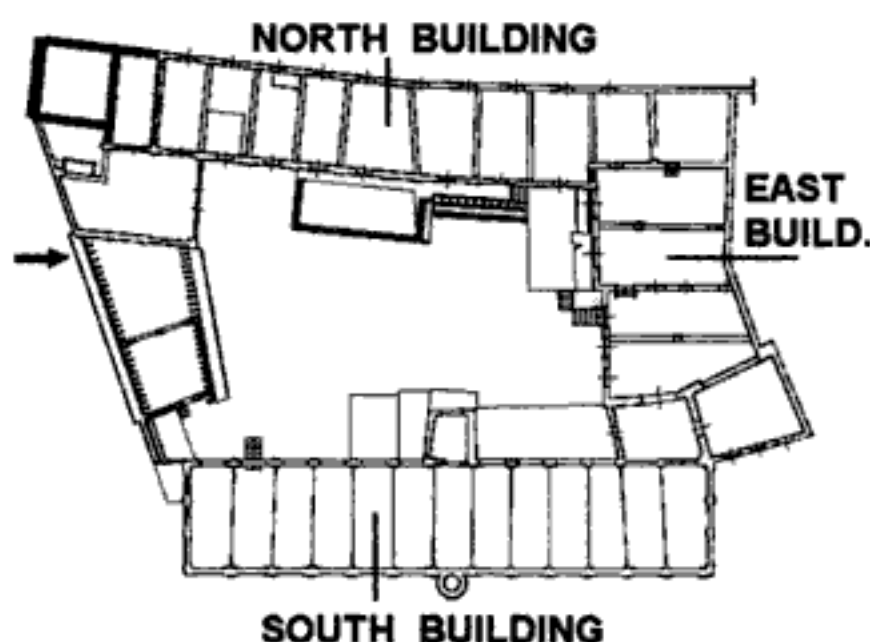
Plan view of the spinning mill's first floor, with indication of the truss positions in the North and South buildings.
